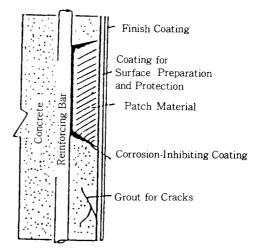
Typical application methods for repair materials for deteriorated reinforced concrete structures
